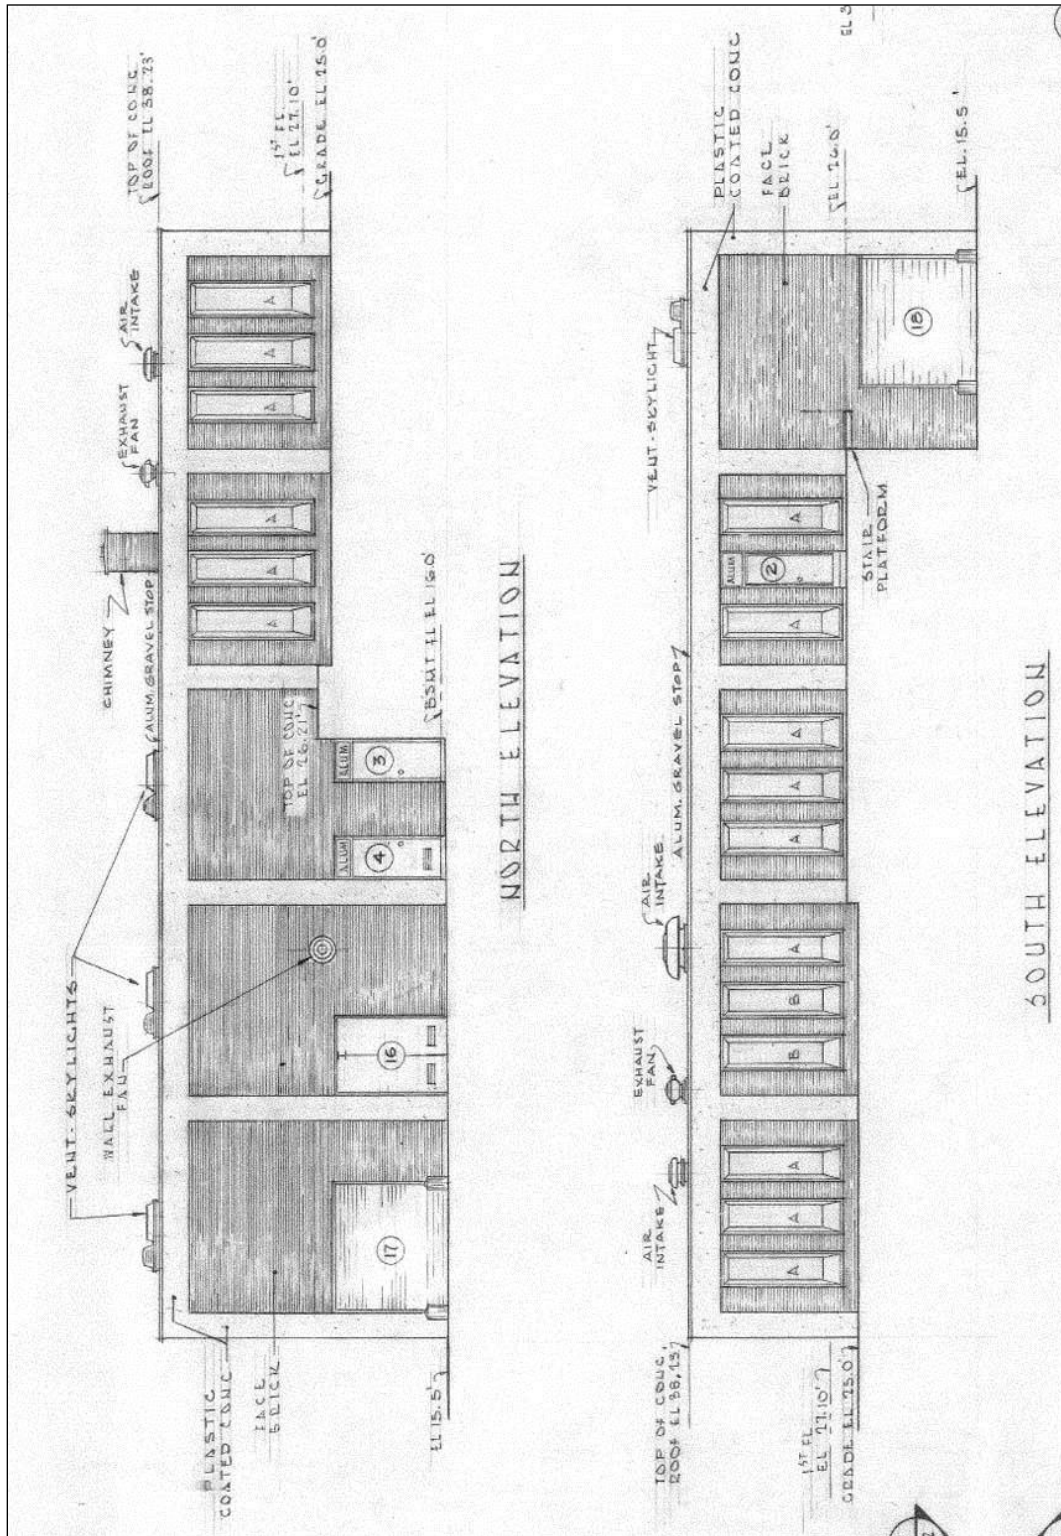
Record drawing of North and South side elevations of Operations Building built 1965, converted to present Sludge Processing Building in 1993. Clip from sheet A-1, Operations Building, Plans and Elevations (Metcalf & Eddy, 1963).
